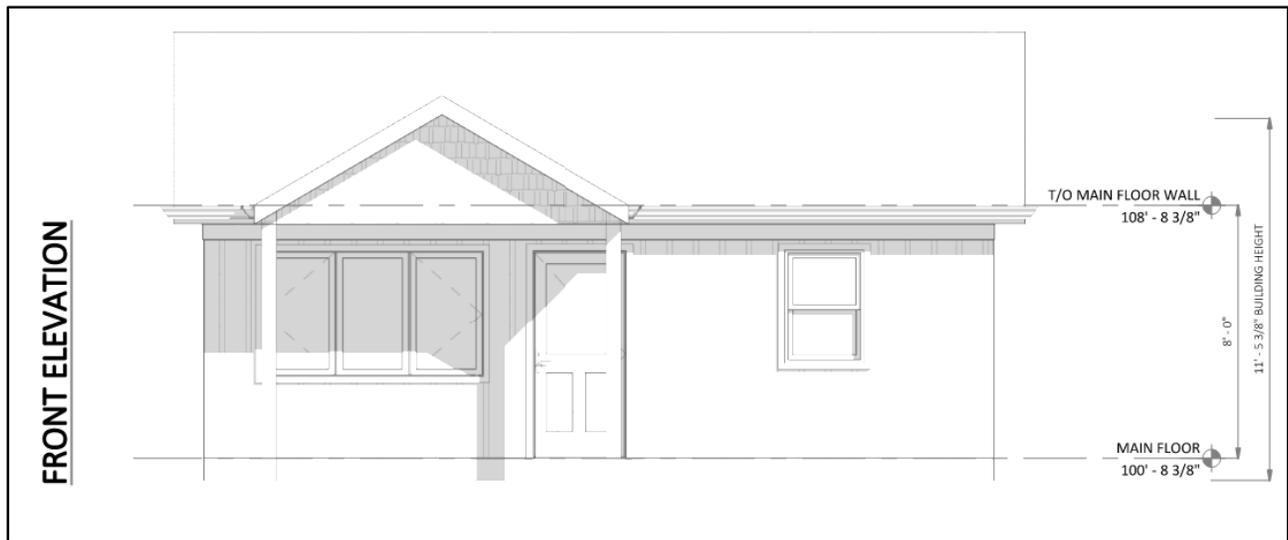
Elevation drawing of the proposed ADU (Detached)
